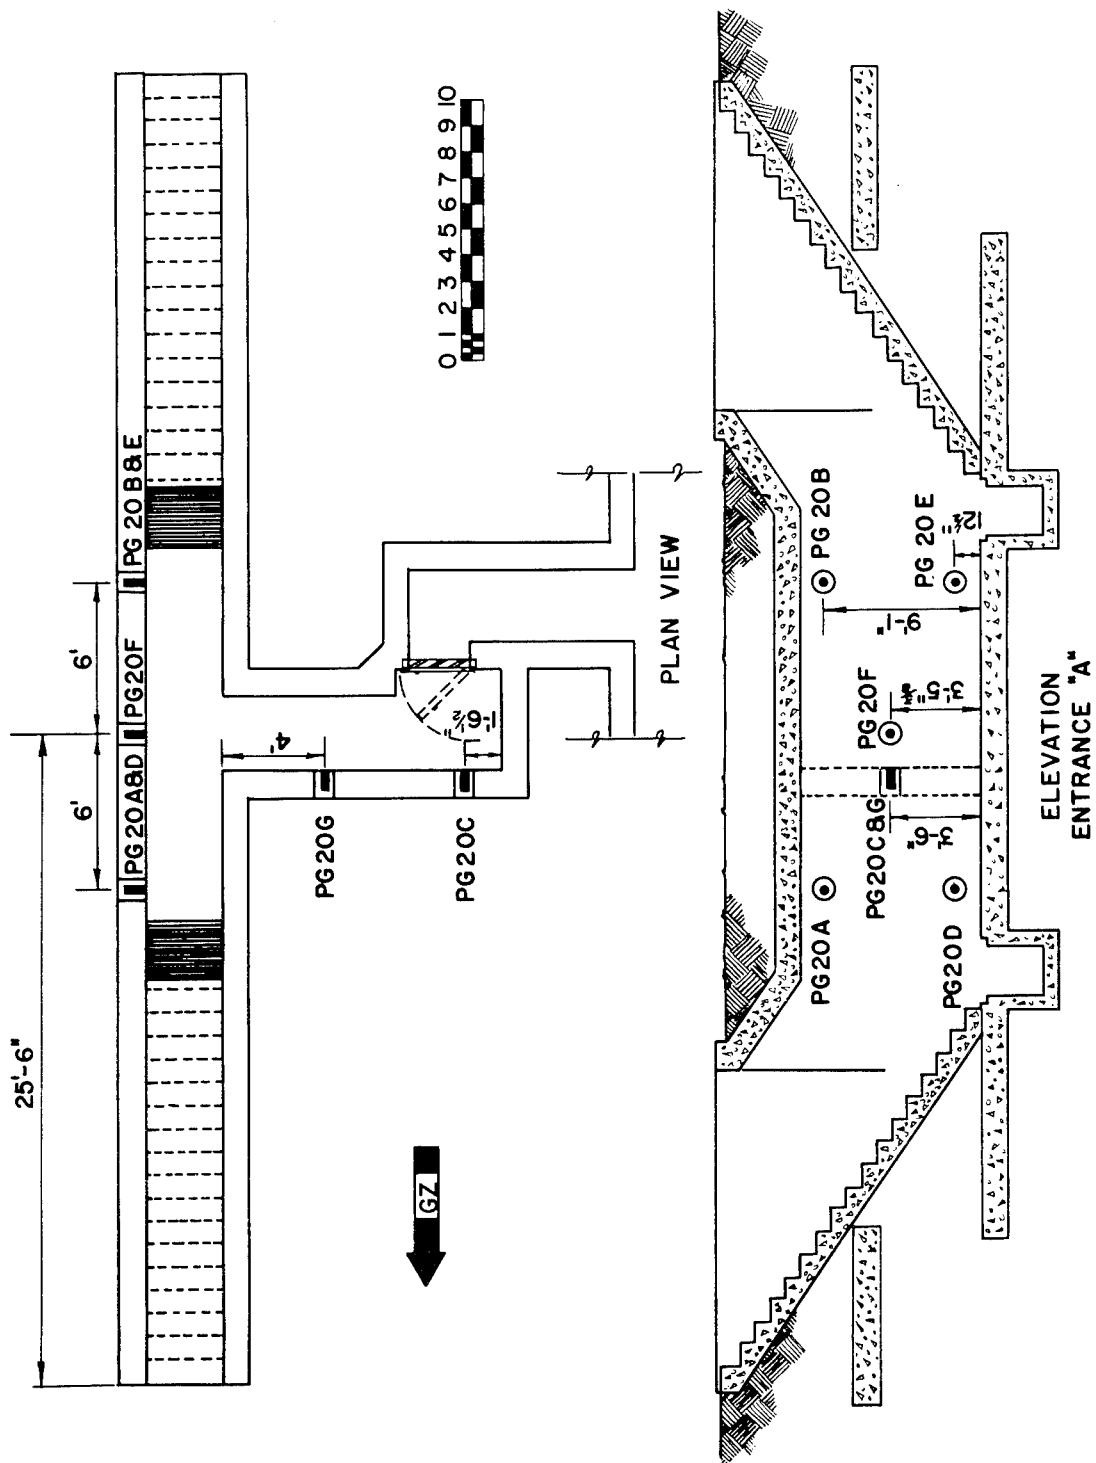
Gage Layout for 3.7 Structure, Entryway A
